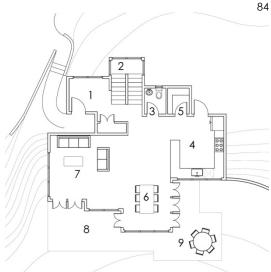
First Floor Plan - 1. Entry 2. Stairs 3. Powder Room 4. Kitchen 5. Pantry 6. Dining 7. Living 8. Deck 9. Outdoor Dining
